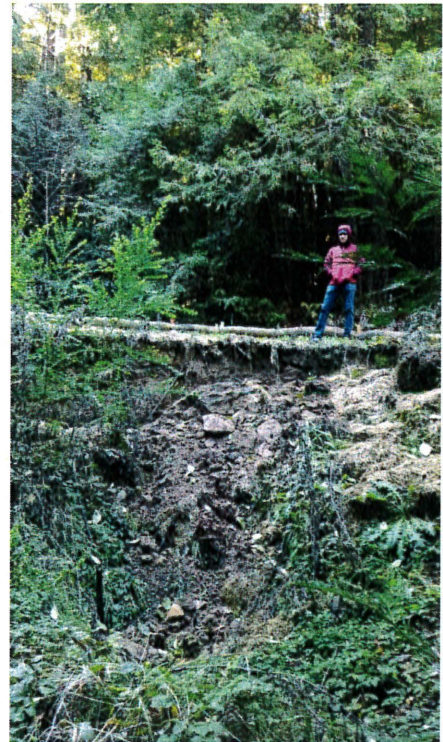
Example of crossing failure: a sinkhole collapsed on the downslope side of Dark Gulch crossing (2015).
